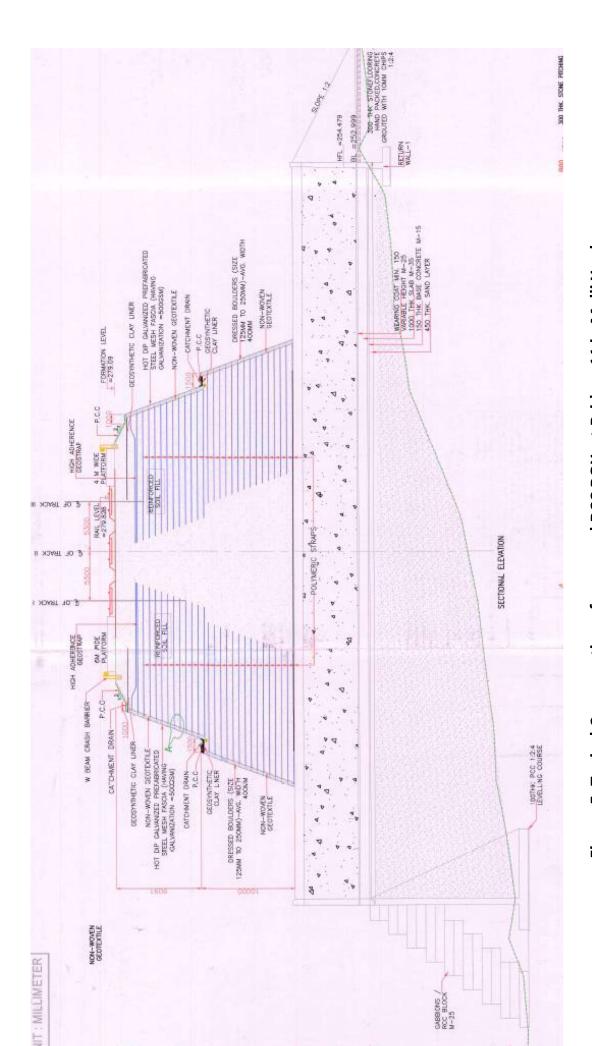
Typical Cross-section of proposed RCC BOX at Bridge- 11 in Melli Yard
